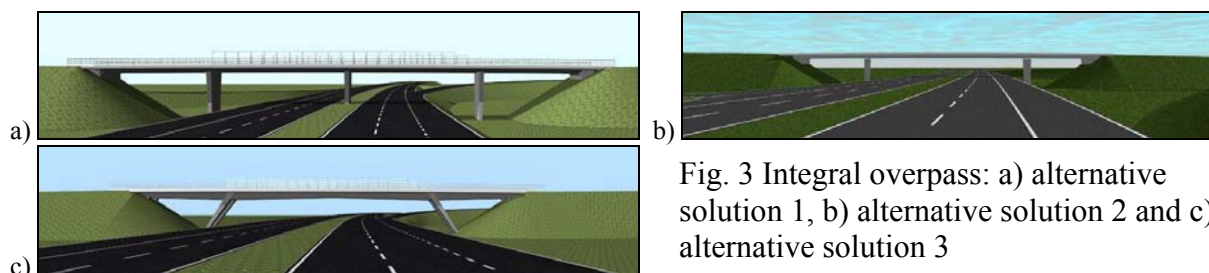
Integral overpass: a) alternative solution 1, b) alternative solution 2 and c) alternative solution 3
